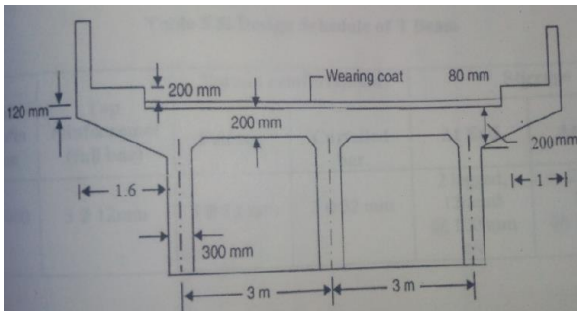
Cross-sectional dimensions of T beam Girder Bridge
